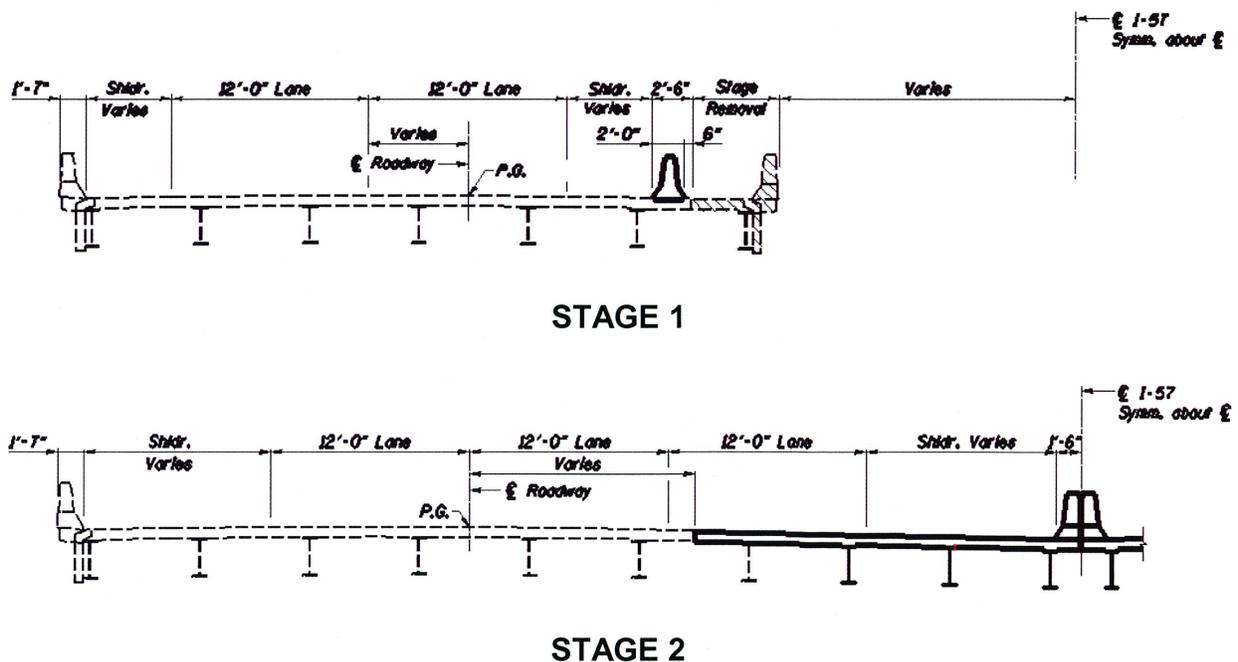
BRIDGE TYPICAL SECTION – INSIDE WIDENING
